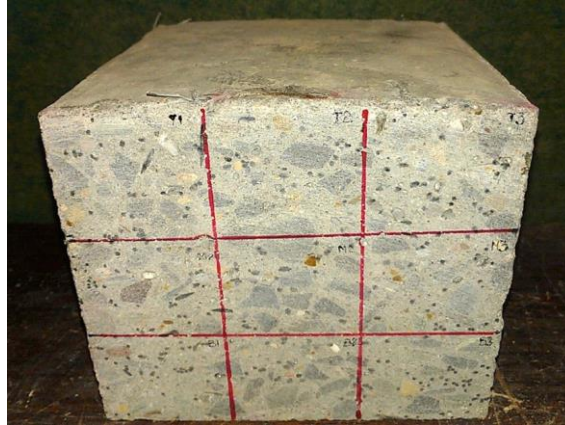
Steel Fibre in a PVAPMC Beam Cross Section
